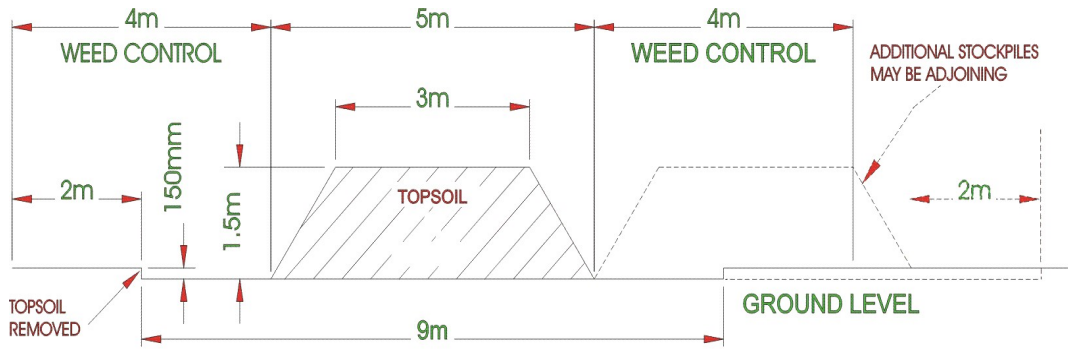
Typical Cross Section for Stockpiles of Topsoil
